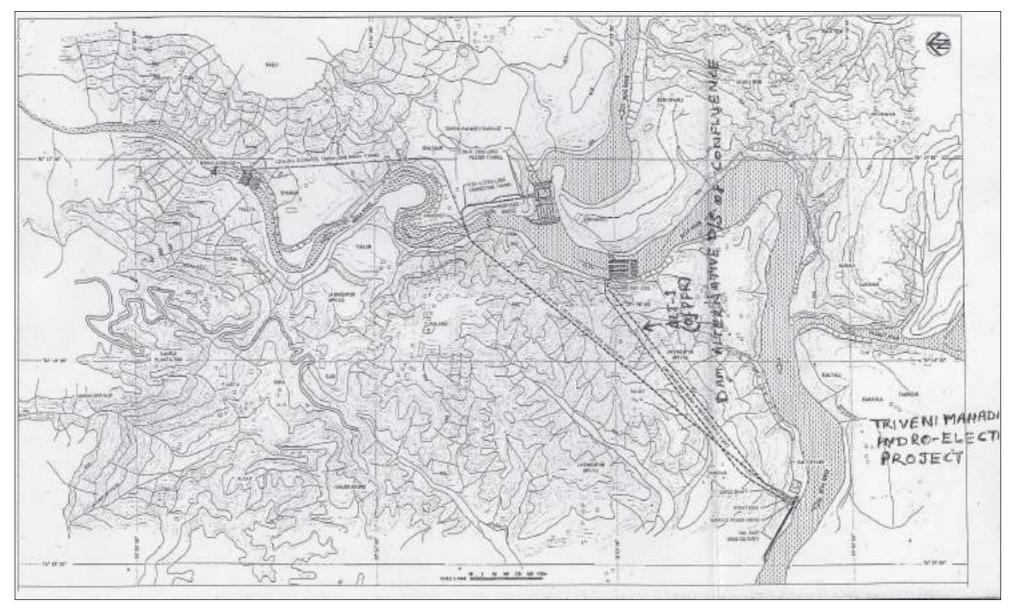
General Layout plan of Triveni Mahadev HEP
